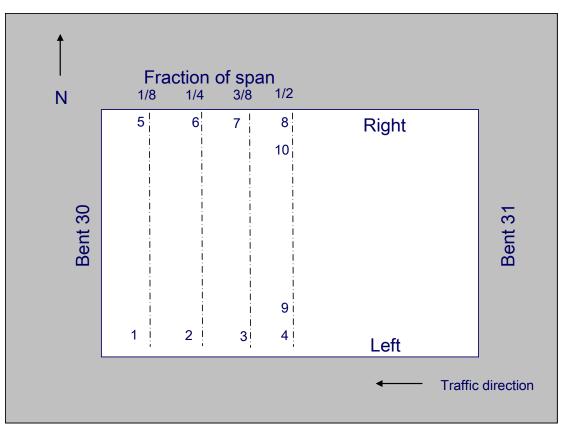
Instrument Location Site 2: Ben White Span 30
